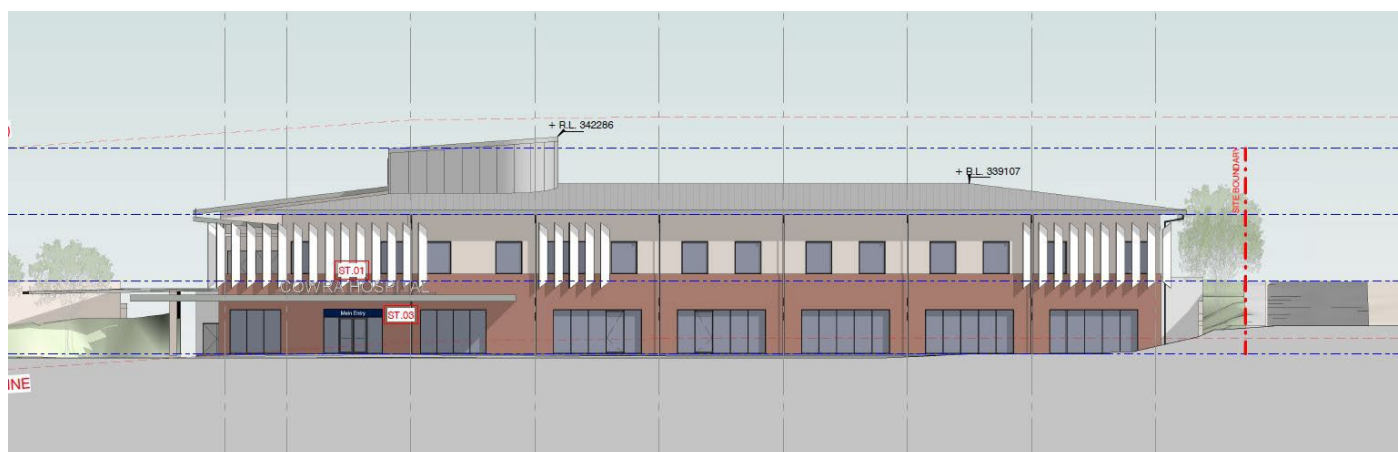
Southern Elevation – Approved May 2023 (source DJRD Architects)
